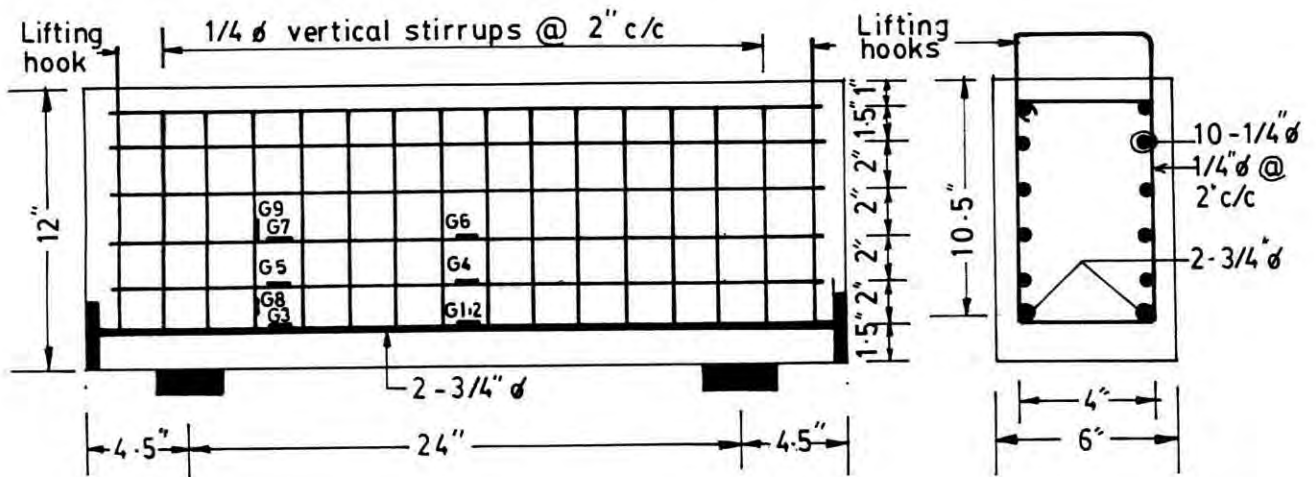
Reinforcement arrangement of beam DB - Q4
